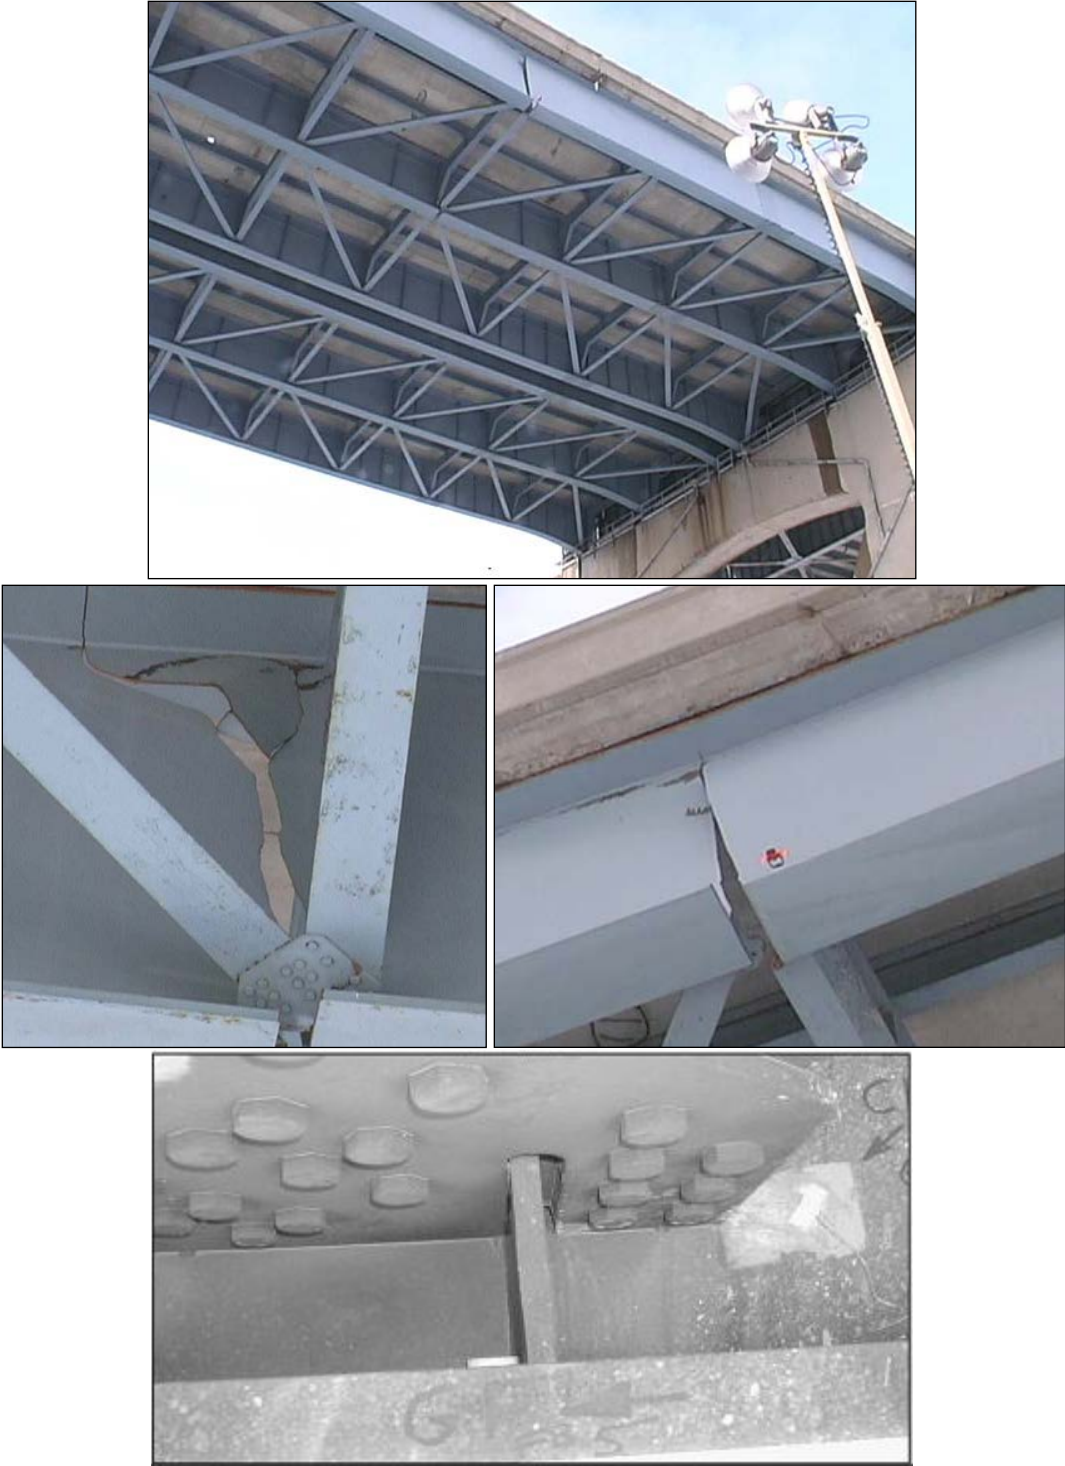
Hoan Bridge post-fracture photos and gusset plate detail.
